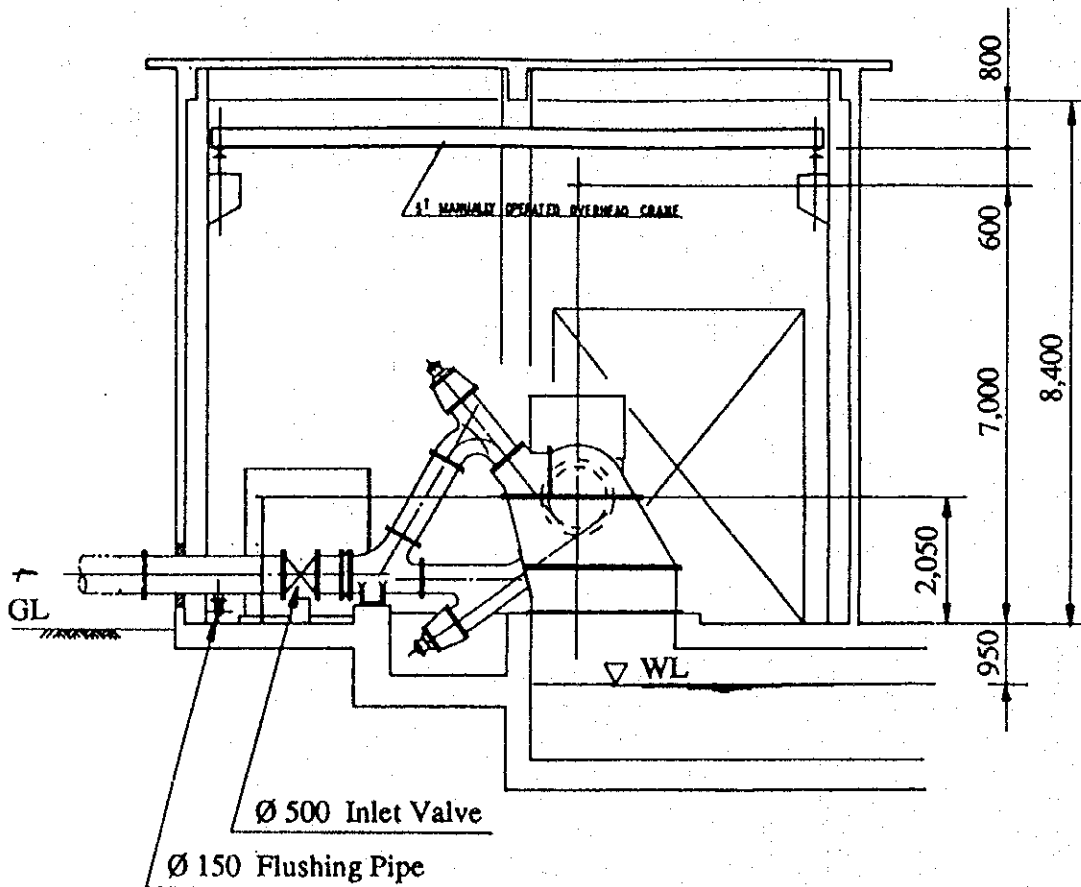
Layout of Alto Hospicio Hydropower Plant
